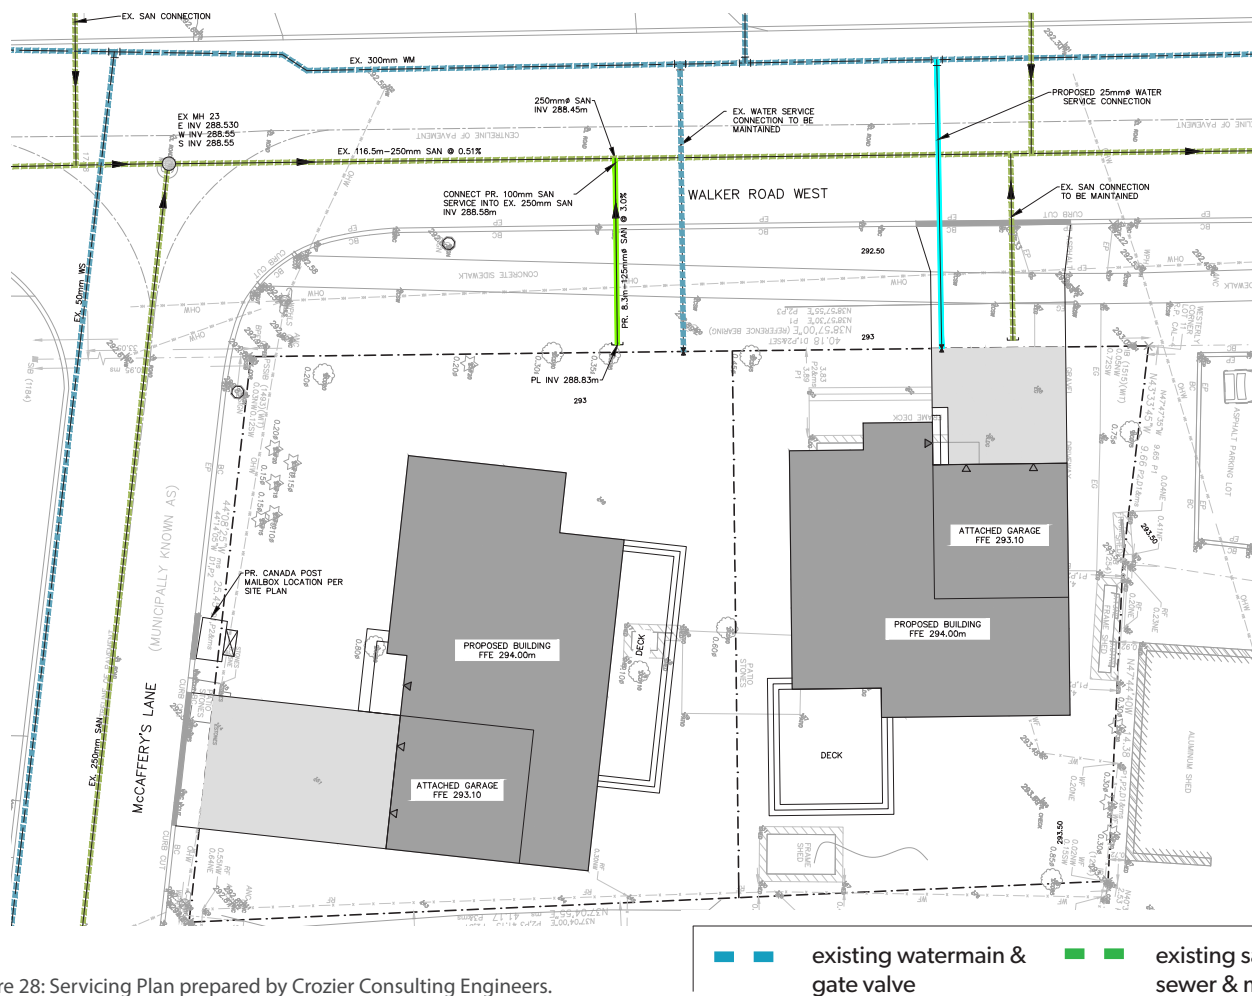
Servicing Plan prepared by Crozier Consulting Engineers.
